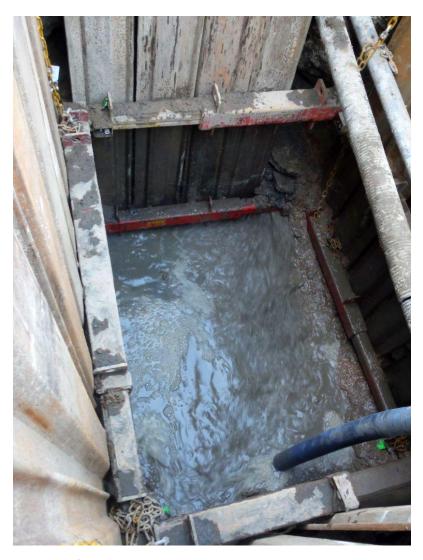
Further ingress of backed up contaminated liquids during deep machine excavation at just above the sewer collapse, facing west
